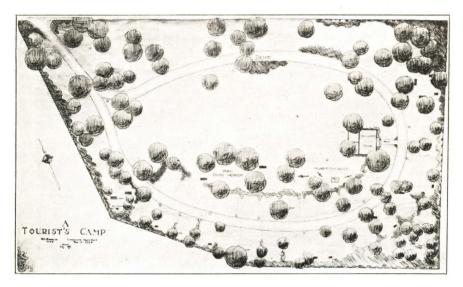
A suggestive plan of a tourists' camp grounds.
